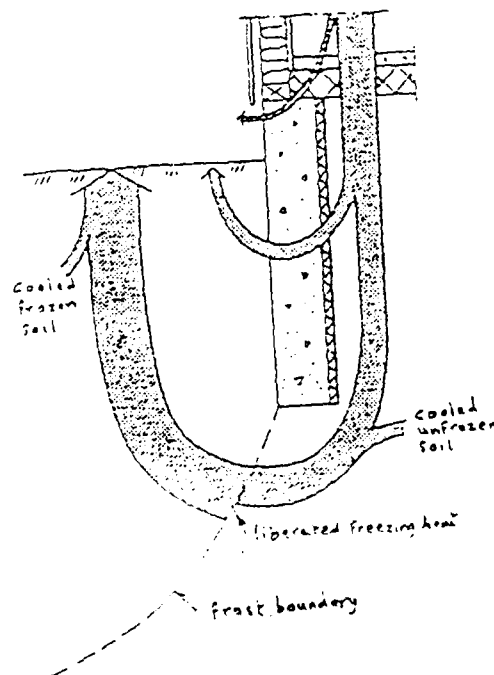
A well insulated floor gives a higher floor temperature but little heat to frost-protect the foundation wall.
